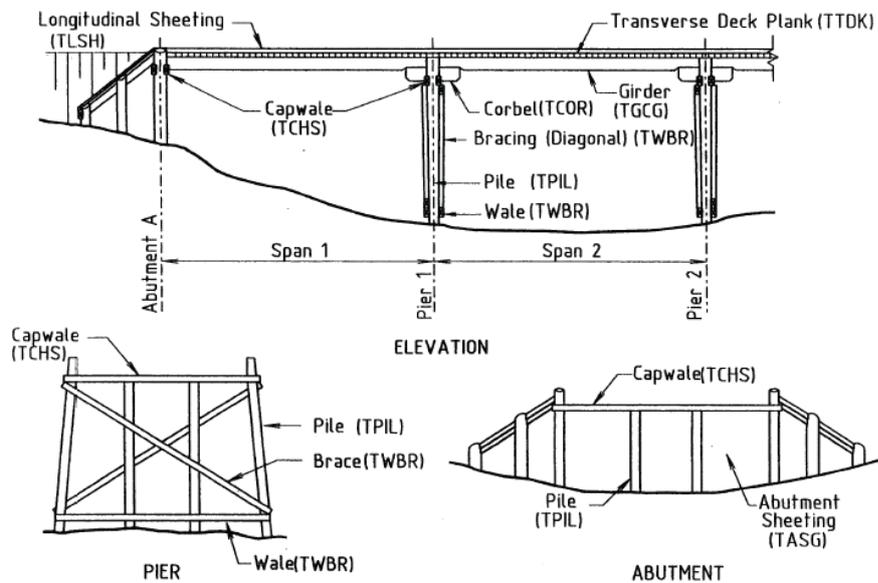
Schematic of multiple span timber beam bridge (RTA, 2007: Sketch No. 11)
